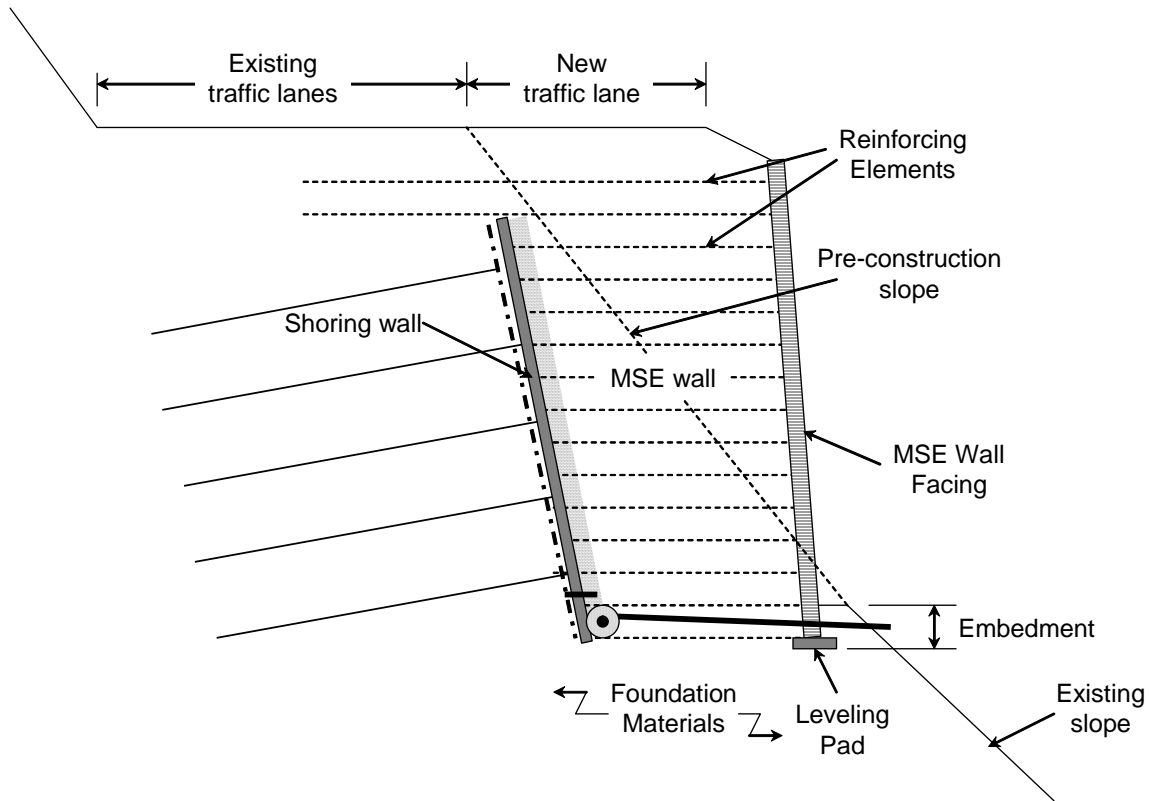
Diagram. Generic cross section of an SMSE wall system.
